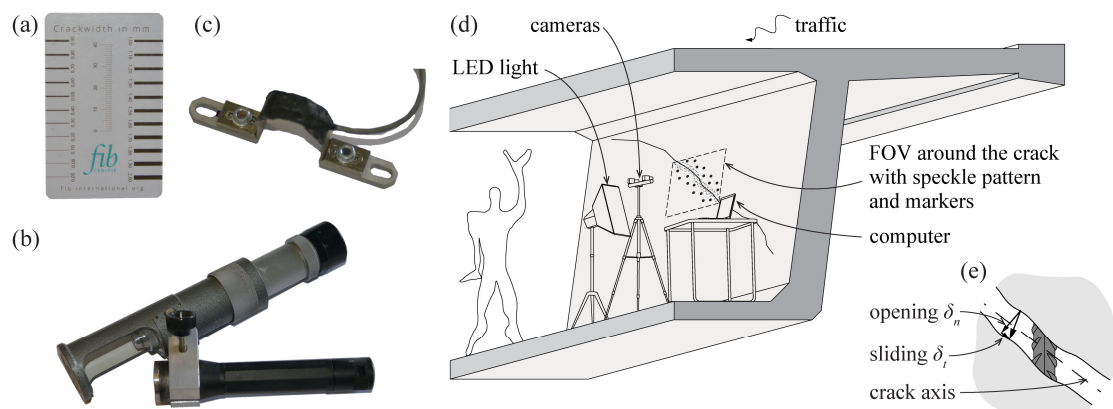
Crack width measurement tools: (a) crack width ruler; (b) crack width microscope; (c) omega gauge; (d) 3D DIC set-up; and (e) crack kinematic components.
